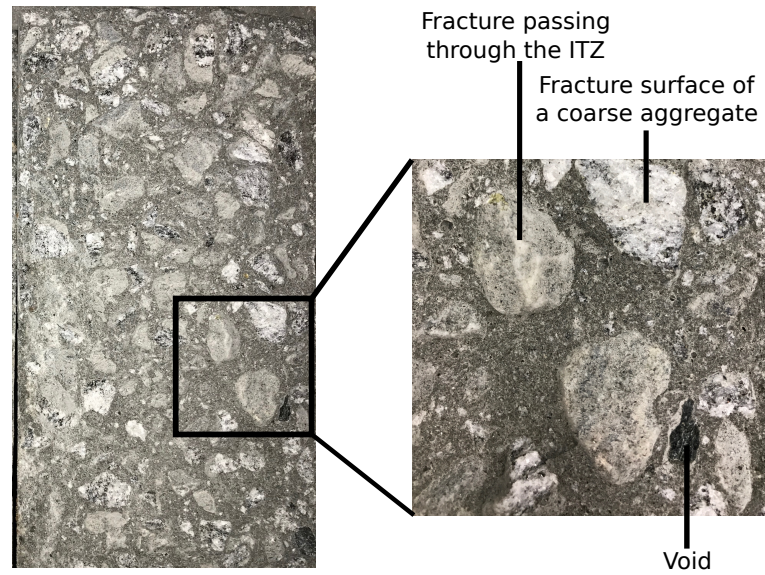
Open surface of a specimen after a Brazilian test, showing fractures passing through both coarse aggregates and ITZ
